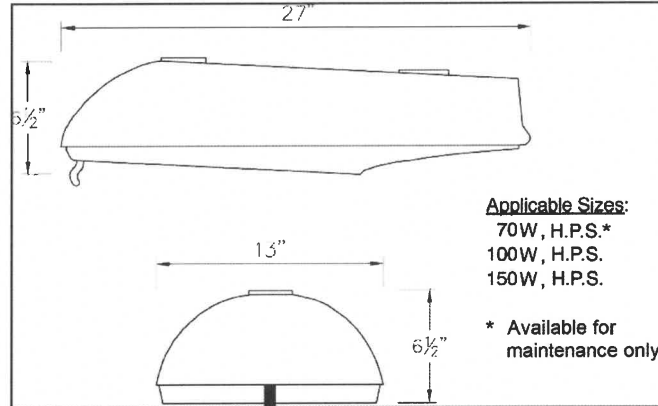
Typical Horizontal Luminaire, Flat-Glass Type
